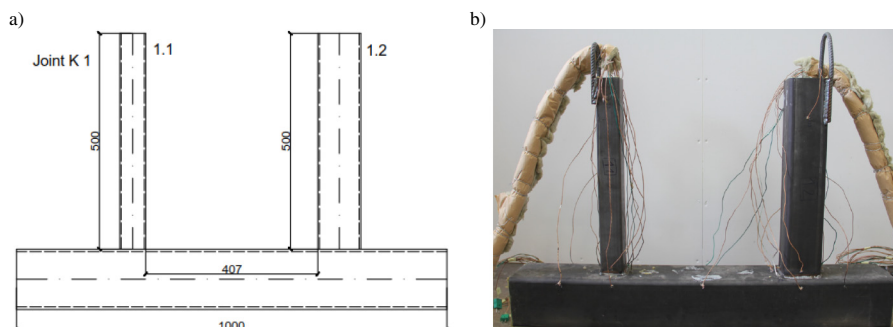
Specimen K1: a) Drawing showing the joint details; b) tested joint with instrumentation.
